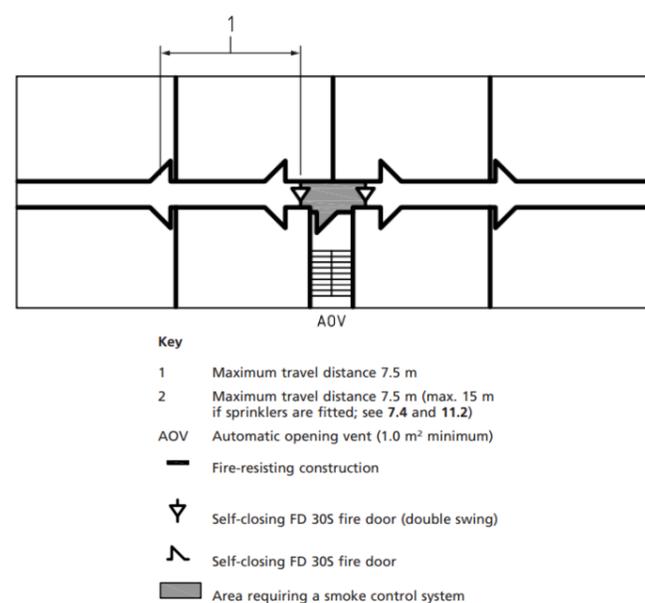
Dwellings provided with corridor access (Single stair buildings)
